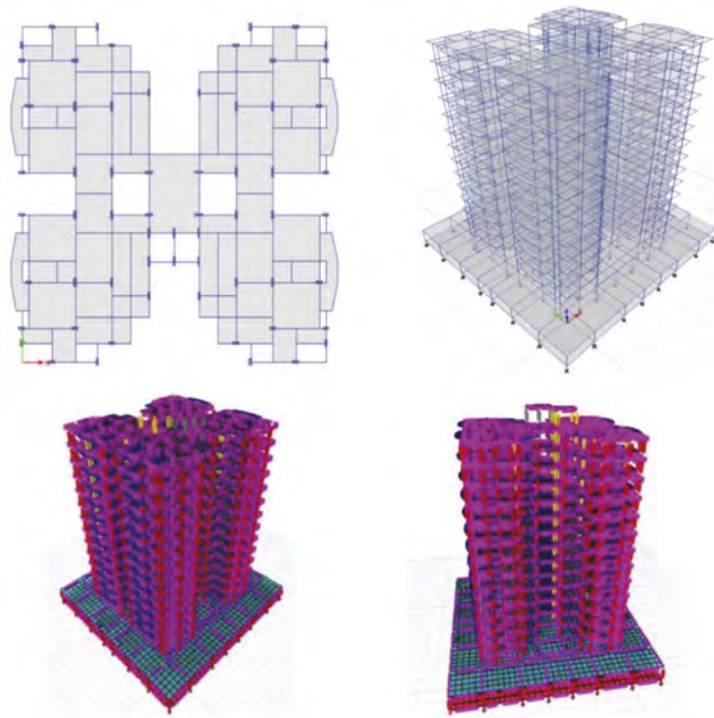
Layout of typical floor, 3D ETABS Model and 3D Rendered view of Aster-2.
